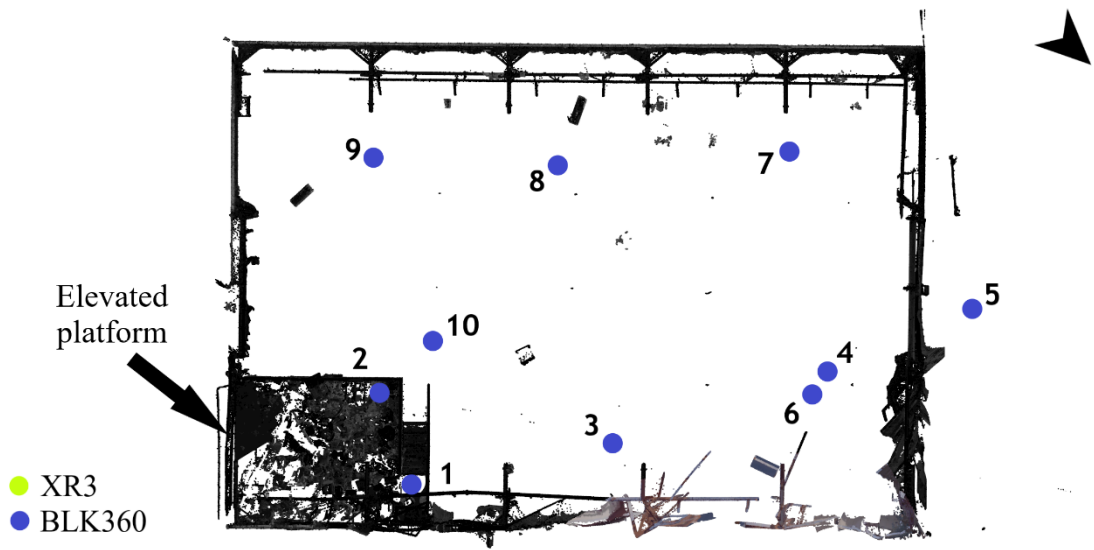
Locations of scans for Tyndall Air Force Base: Building 375
